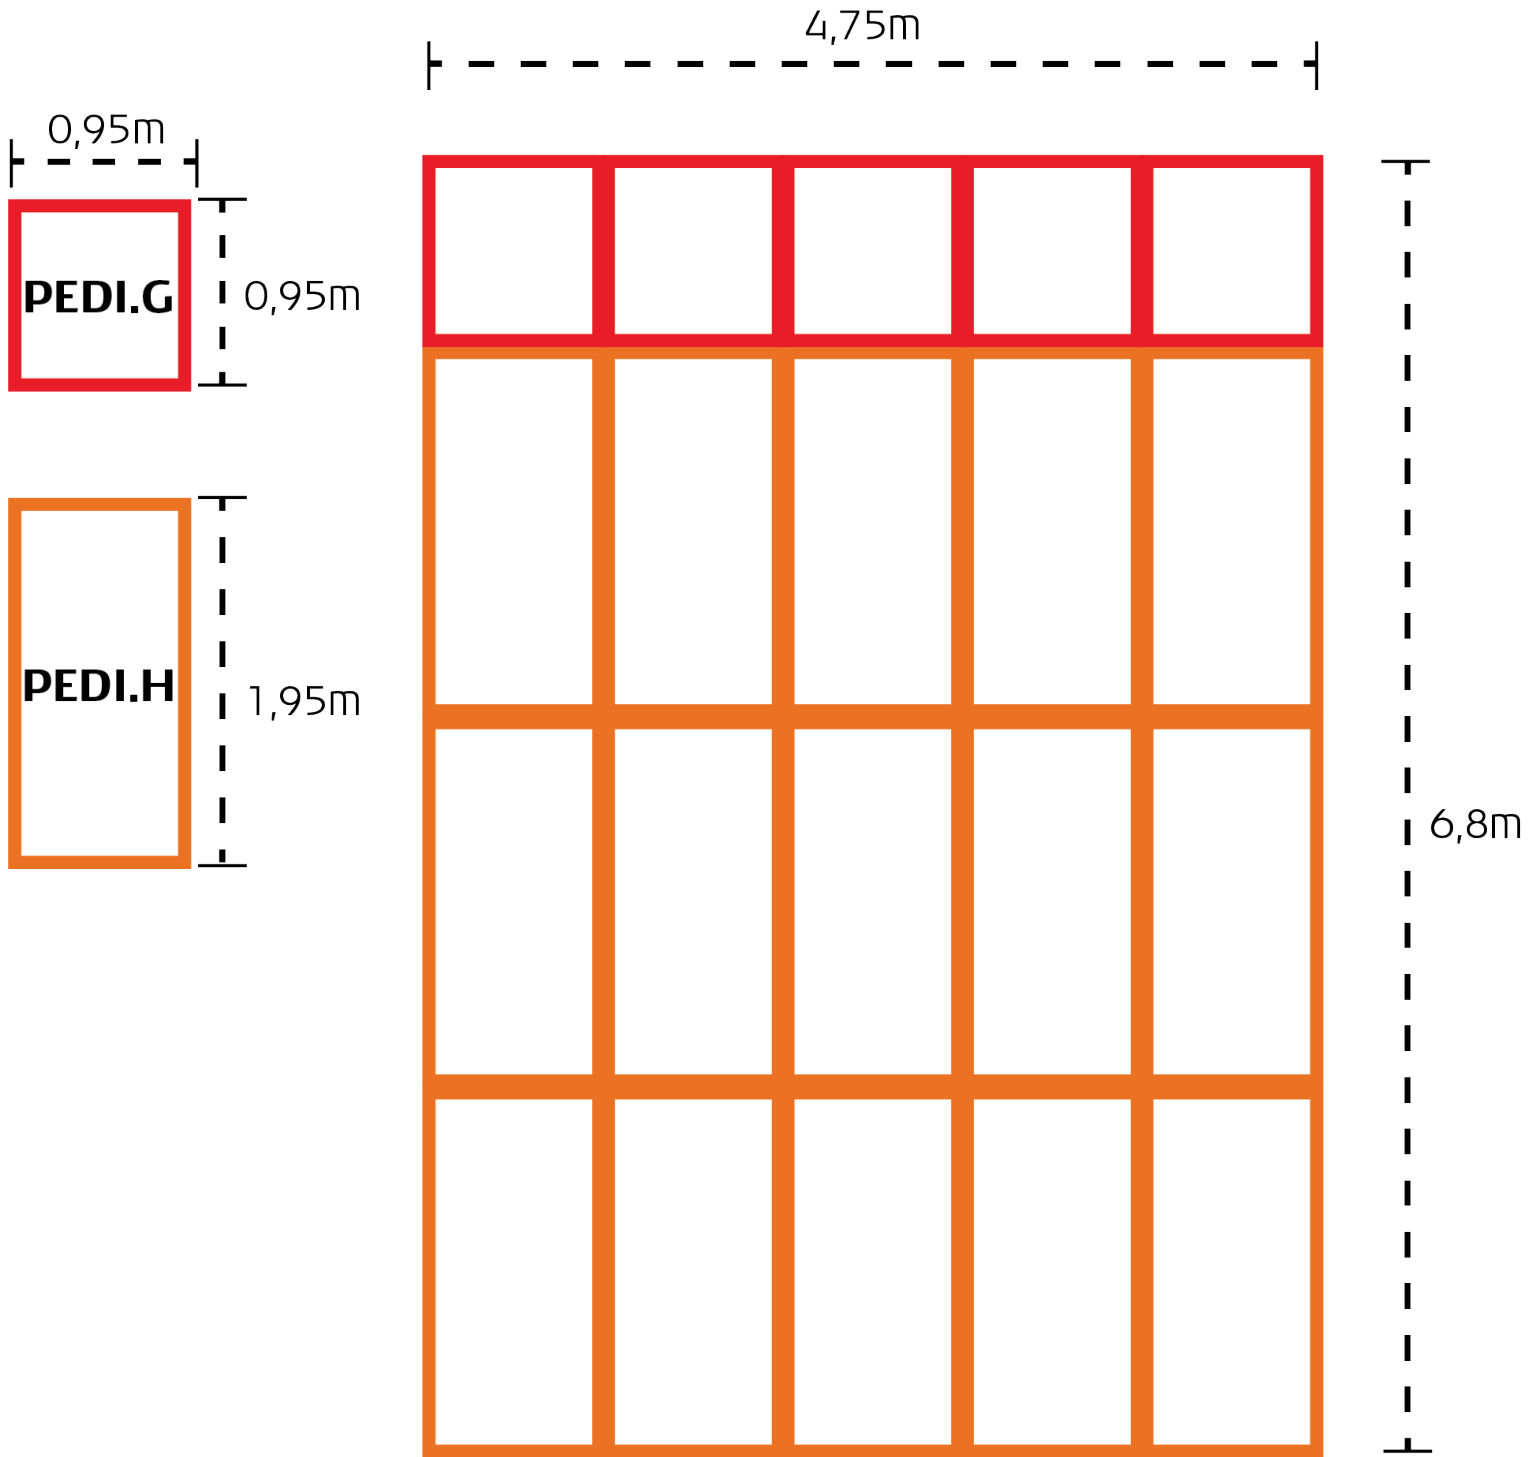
Rimatek floorboard arrangement to be placed beneath one engine
